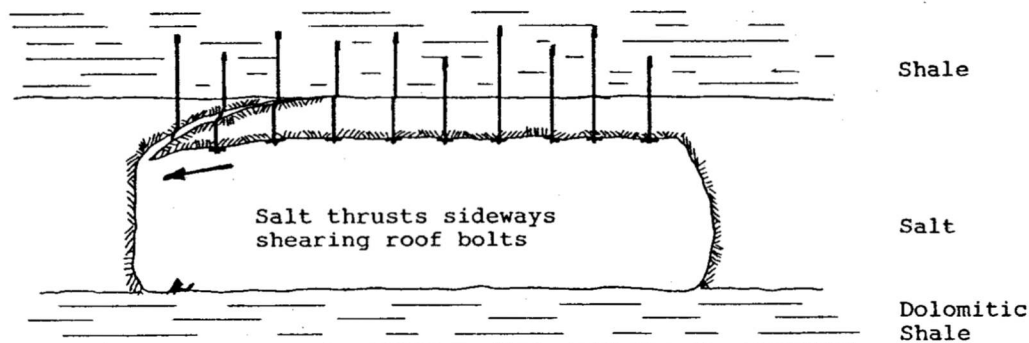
Cross section of typical roof failure in salt roof.
